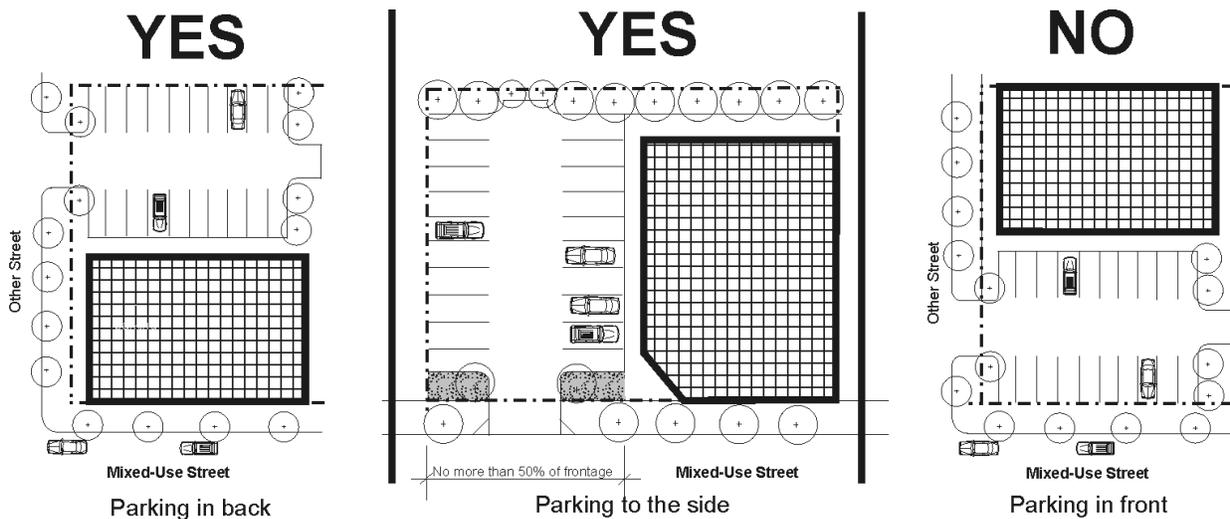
B.30.100g. Acceptable and unacceptable parking lot configurations along mixed-use streets.
